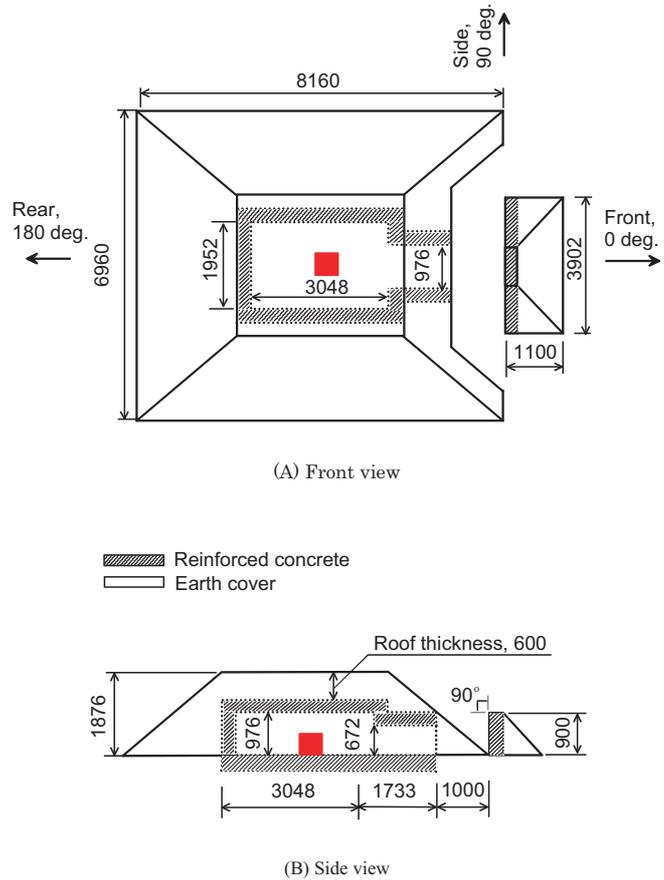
Model of ECM with barricade used in 160 kg test (Unit: mm).
